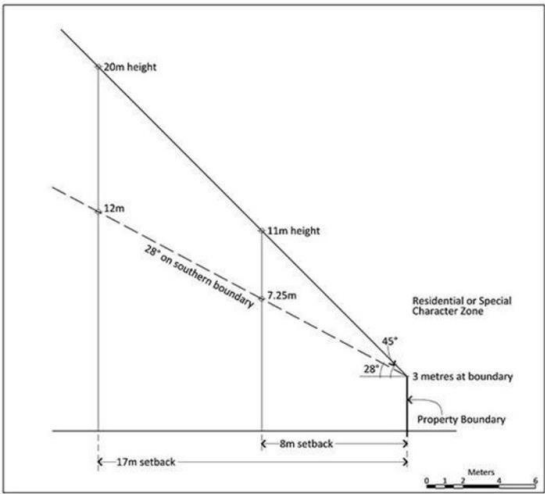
Building envelope for buildings located on an Arterial Transport Corridor
